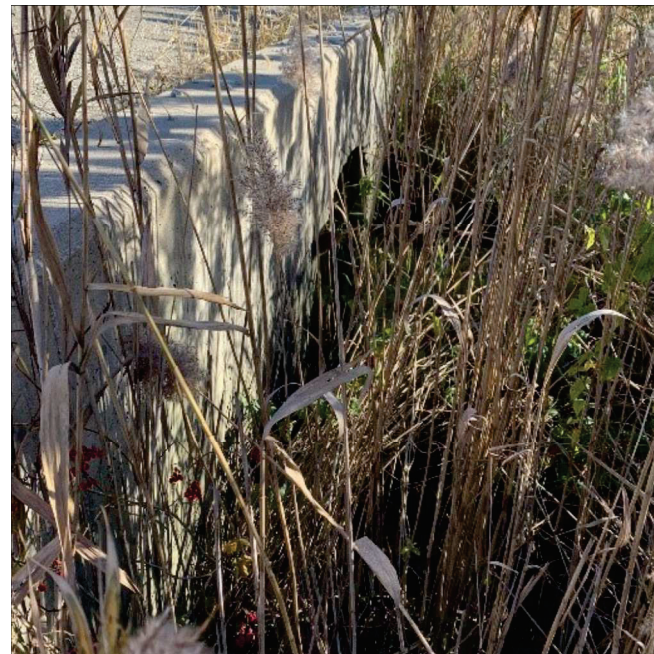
Watercourse Crossing 5 is a large culvert and concrete headwall conveyed under CR 46.
